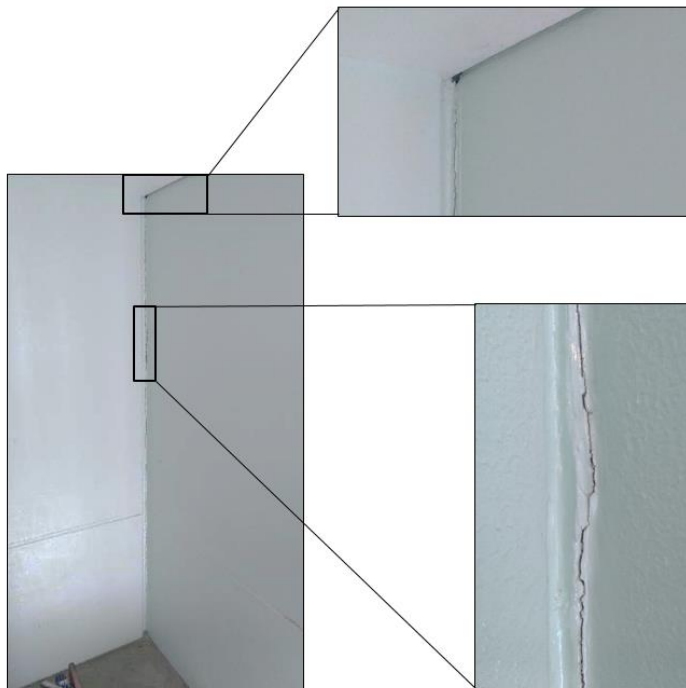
Gaps between adjacent wall panels in the lift and stair cores
